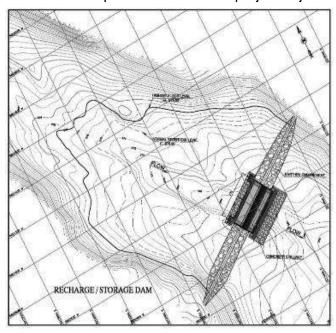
Recharge/Storage Dam with Earth Embankment and Concrete Spillway
